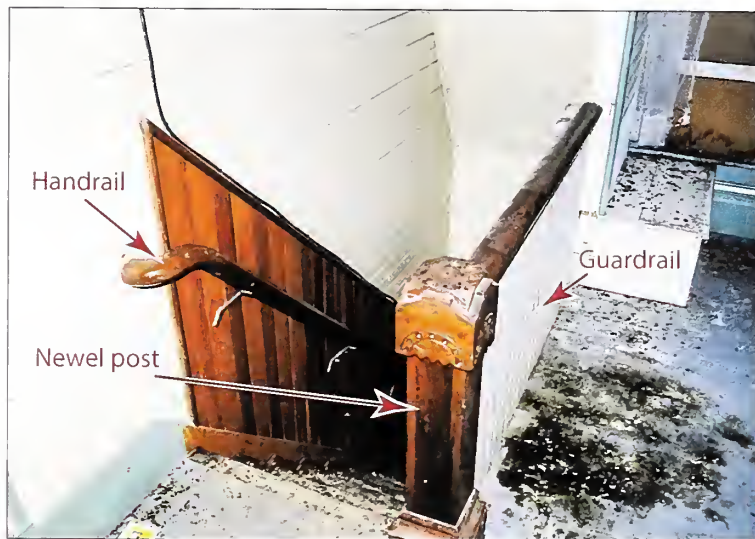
This handrail is in good condition. It should be raised so that it is 34 to 38 inches above the noses of the steps. The guardrail should be rebuilt so that the top of the rail is 42 inches above the floor. Because this structure is historic, the top rail, newel cap, and newel base should be refinished and mounted atop longer balusters and a newel post that have the same horizontal dimensions and appearance as the originals.
